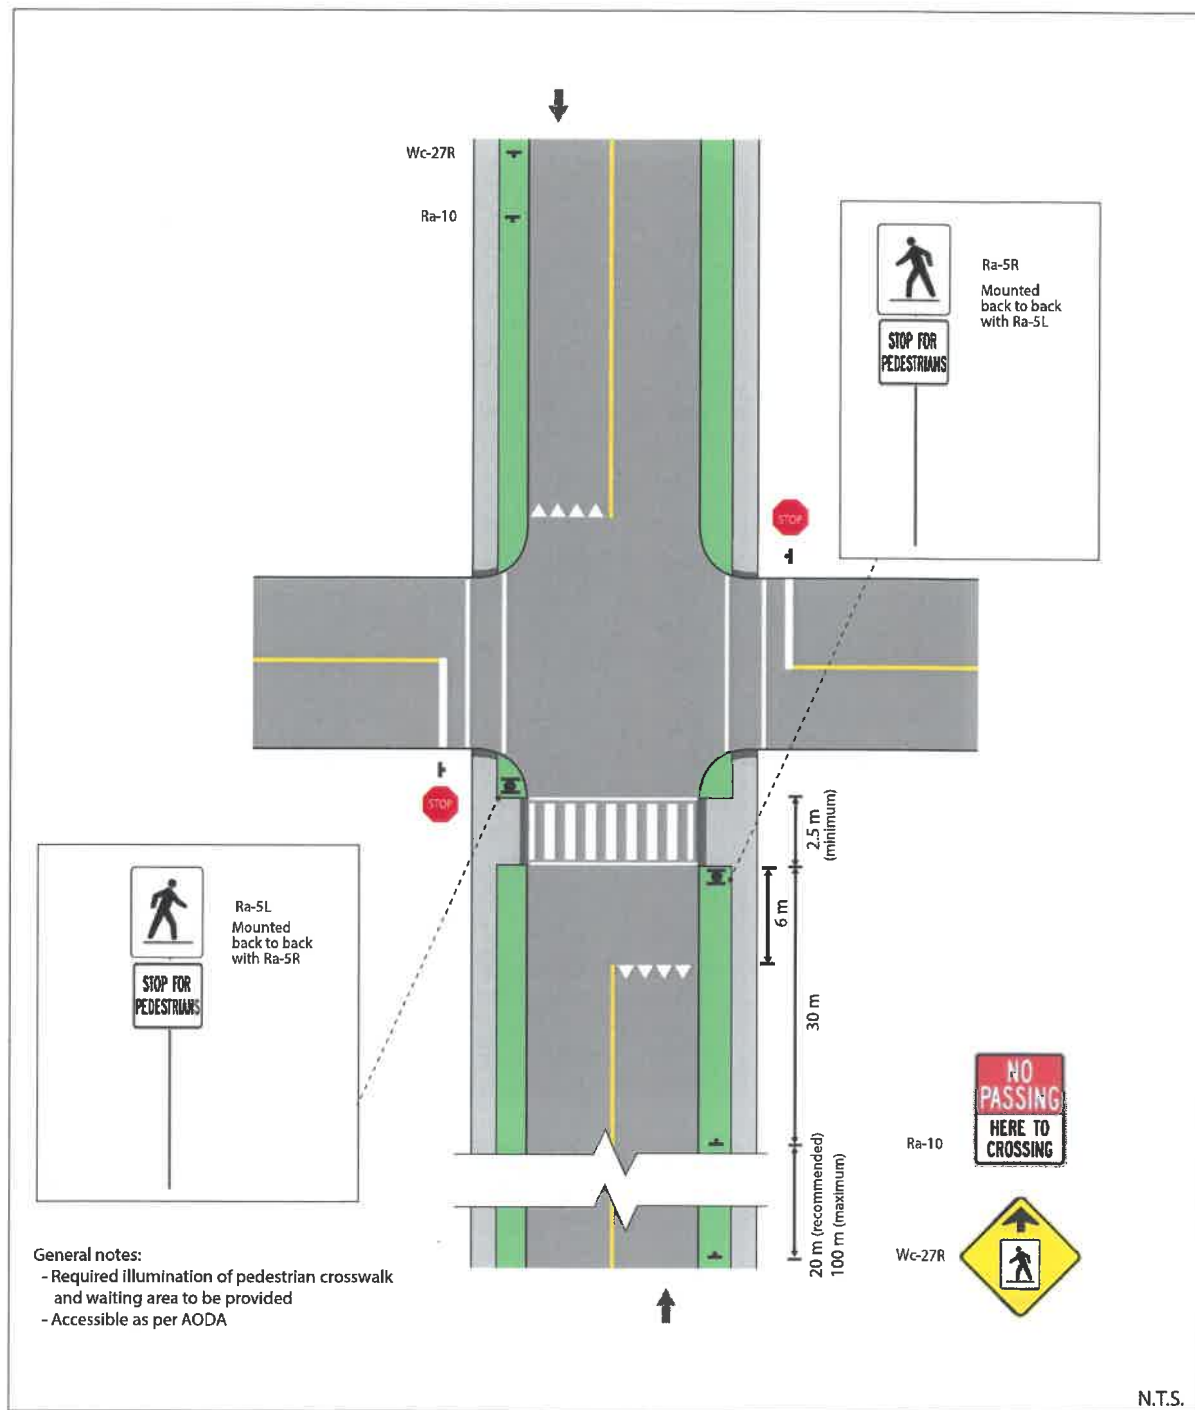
Pedestrian Crossover Level 2 Type D – Intersection (2-way)
